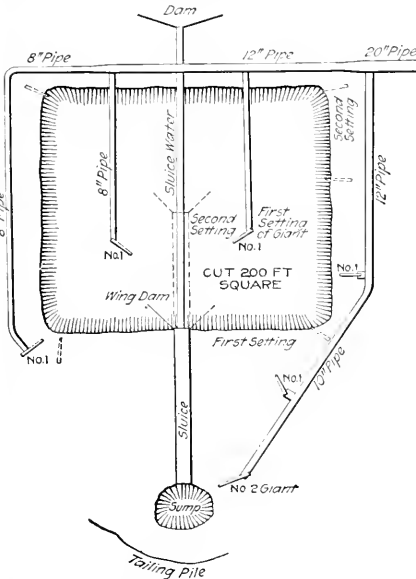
PLAN OF FALL, HYDRAULIC MINE
